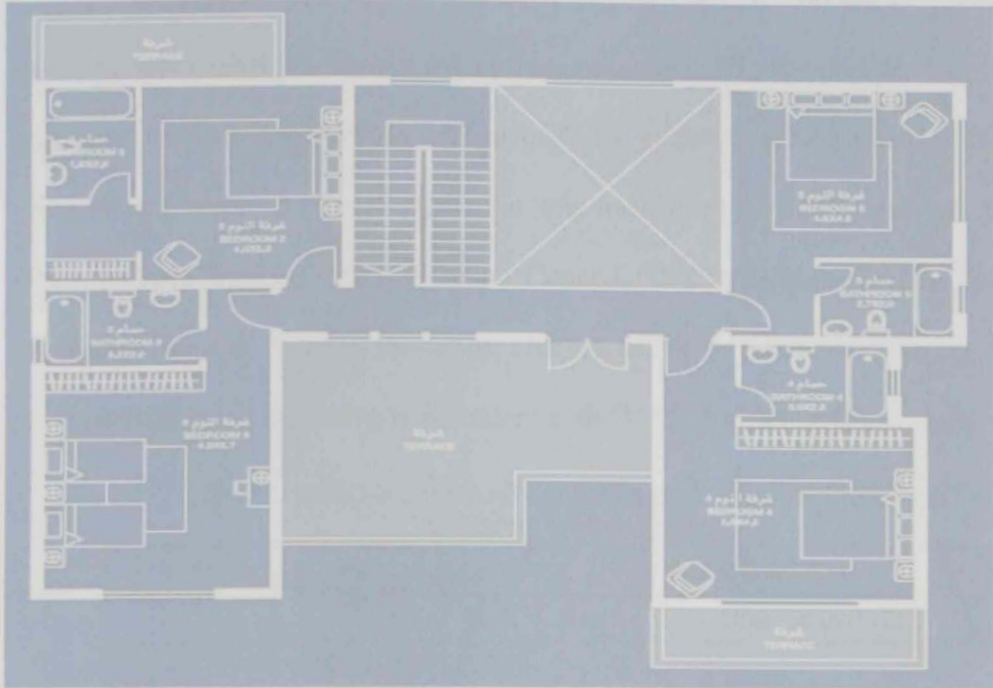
SZHP, First Floor Plan, Sample of Houses (Source: SZHP, 2013)
